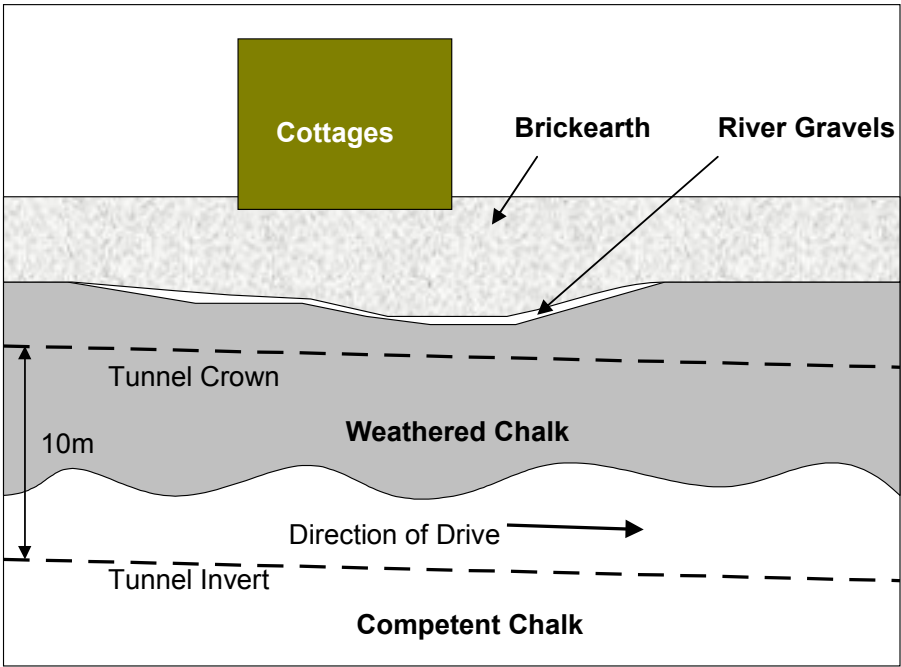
Cross-section showing ground conditions at Pegwell Road cottages
